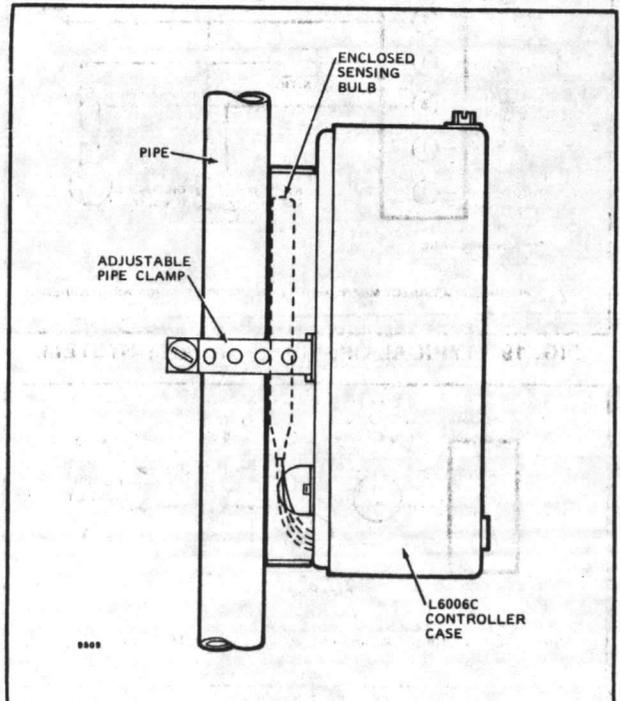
MOUNTING L6006C DIRECTLY ON SURFACE.
